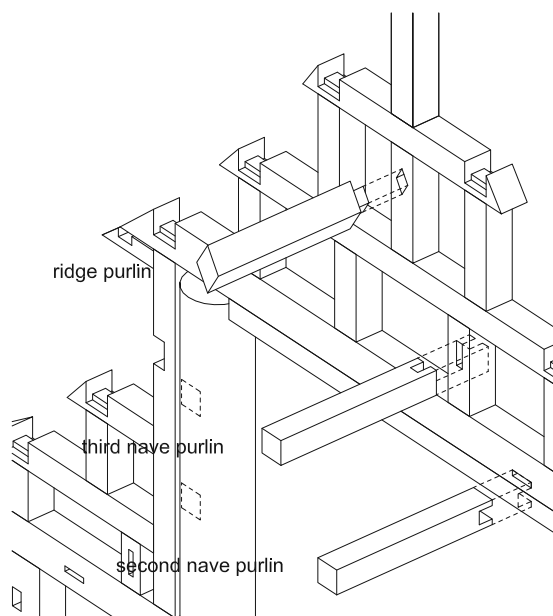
Purlins from the first bay meeting the second transverse frame in nave roof
